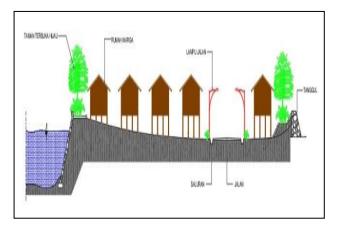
The form of house construction in the Tanjung Putus hamlet.
